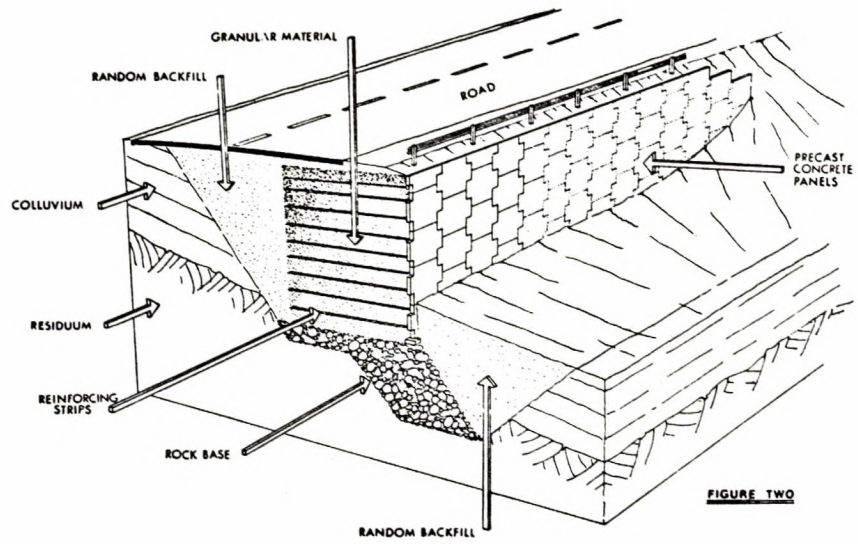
Reinforced earth using pre-cast concrete panels (29).
